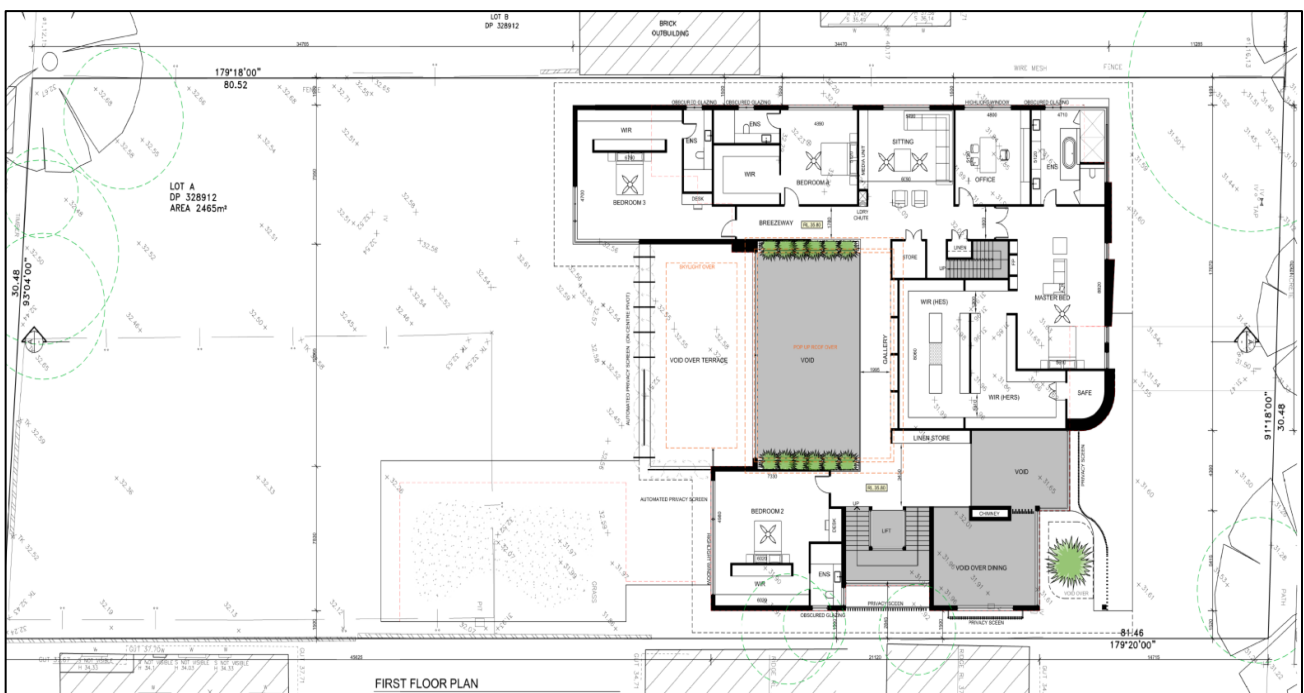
Extract of the applicant's submitted First Floor Plan.
